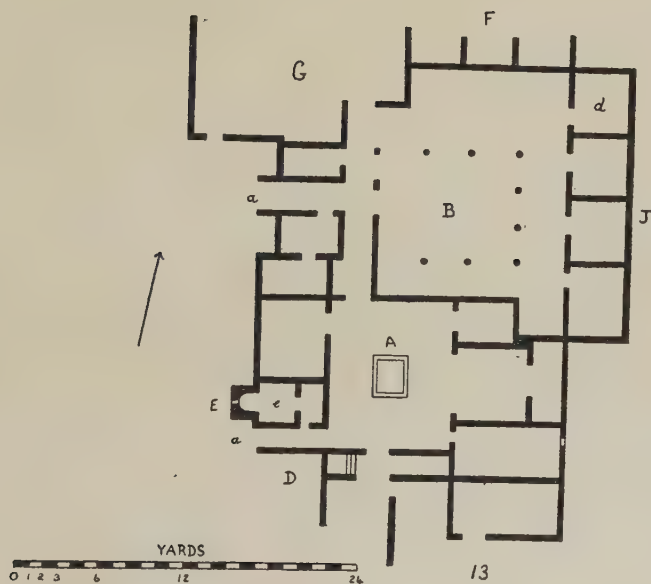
TYPE III: 'TOWN-HOUSE' VILLAS (nos. 12-13)
